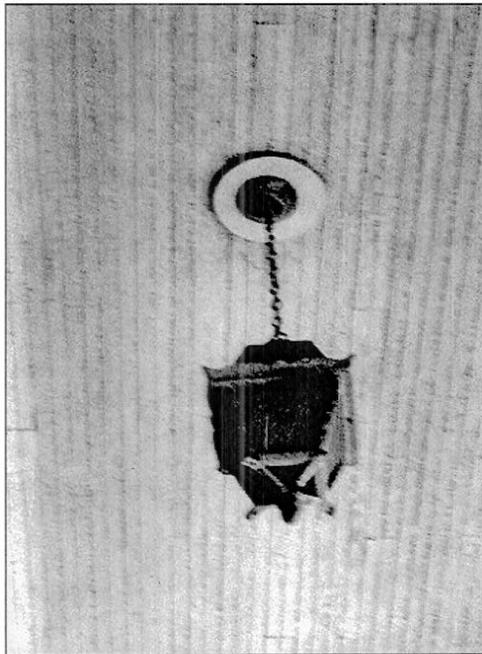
Fort Hayes Memorial USARC, Building 118, viewing hanging lamp located on interior of porch roof.
